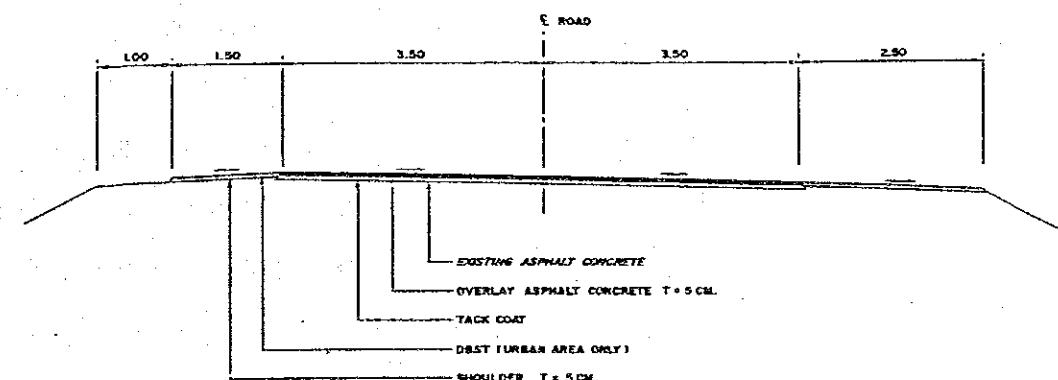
FIGURE TYPICAL PAVEMENT STRUCTURE FOR FLEXIBLE PAVEMENT ML-3
